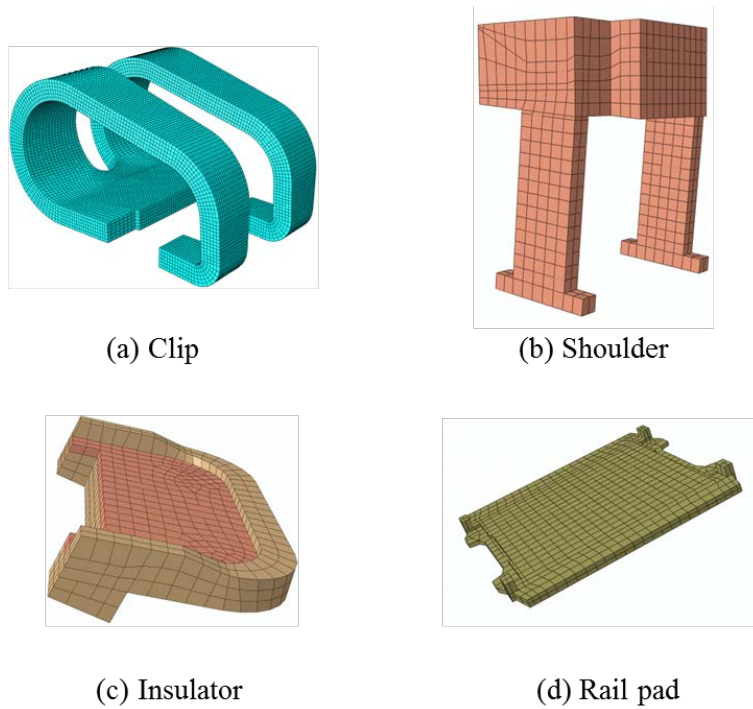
Components of the Fastening System: (a) Clip, (b) Shoulder, (c) Insulator, and (d) Rail Pad
